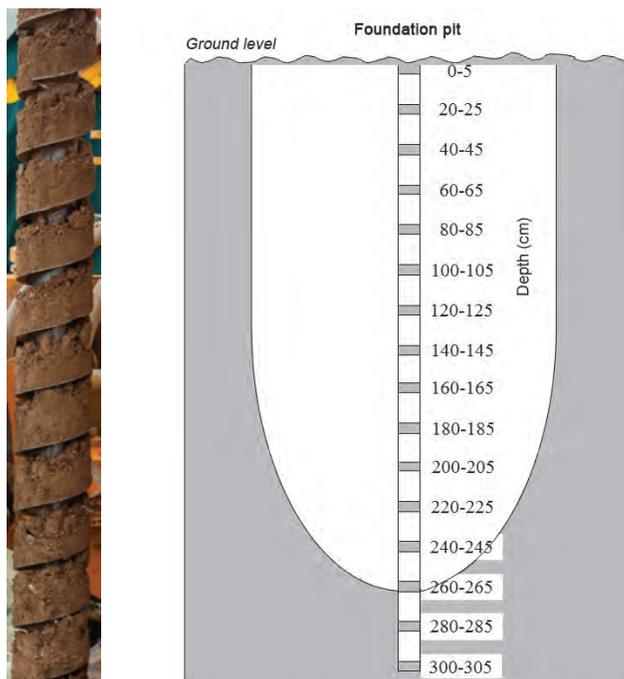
General diagram of soil sampling layer by layer when drilling in foundation pits (trenches) and the auger type
